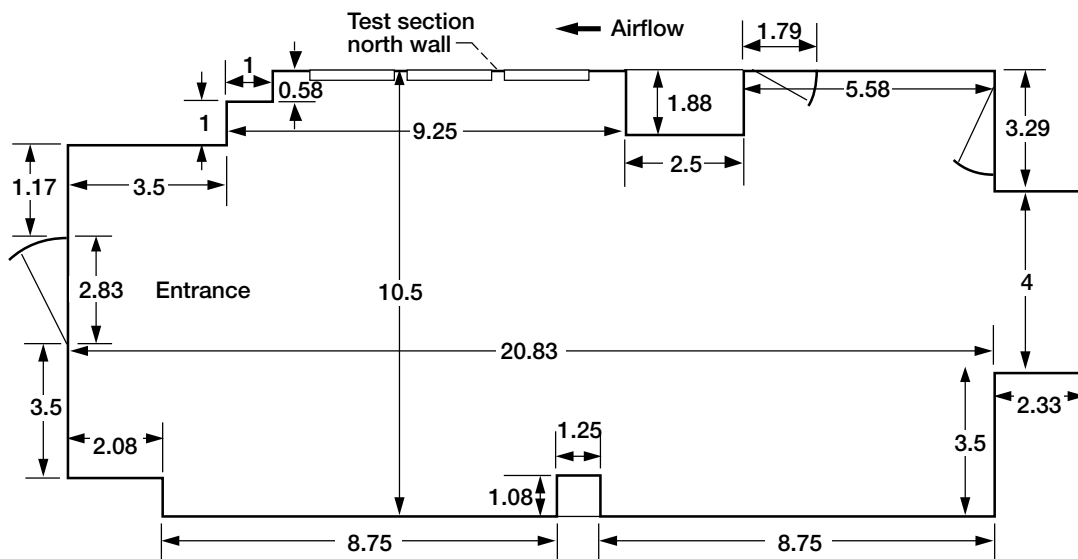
Floor plan of IRT secondary (customer) control room. All dimensions are in feet.
